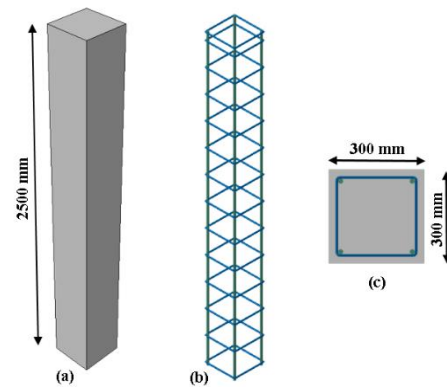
(a) Geometry of the reference column; (b) Reinforcement details; (c) Cross-section.
